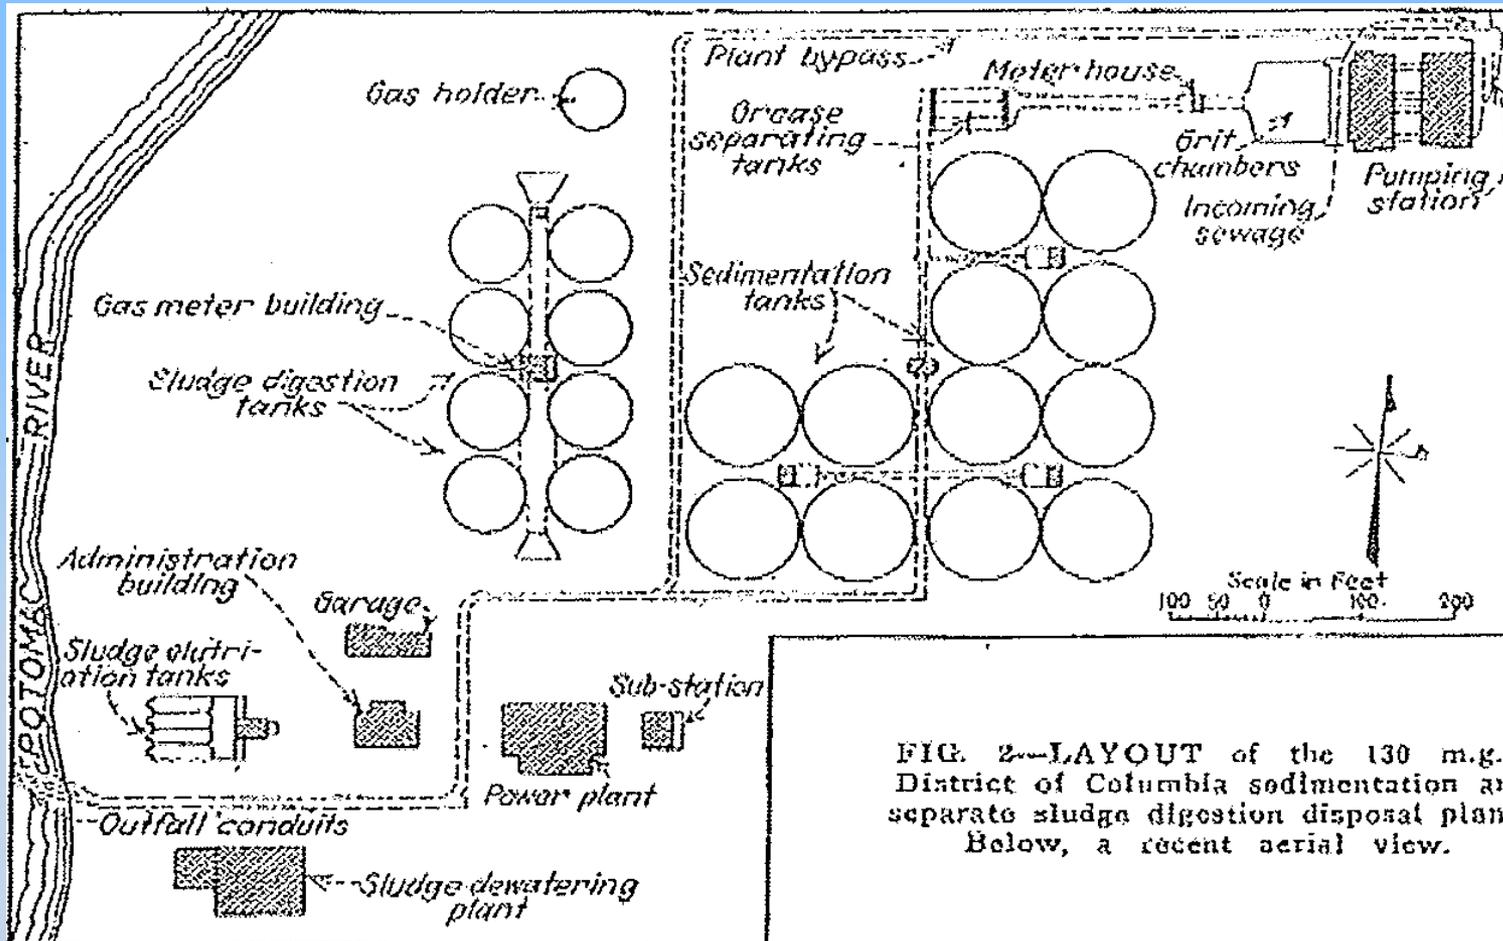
LAYOUT of the 130 m.g.d. District of Columbia sedimentation and separate sludge digestion disposal plant. Below, a recent aerial view.
